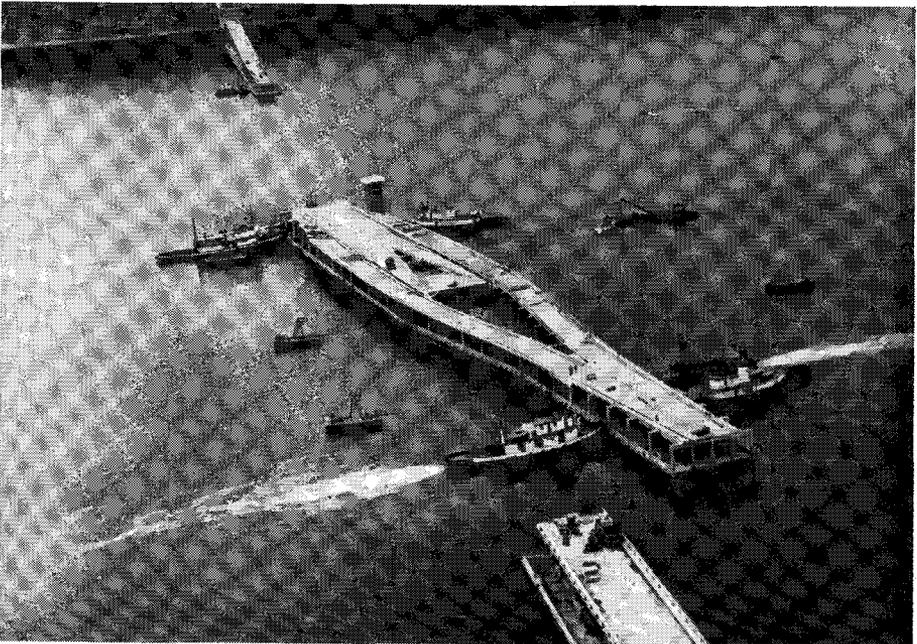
Prestressed concrete floating bridge, Hood Canal, State of Washington. March-April 1971
